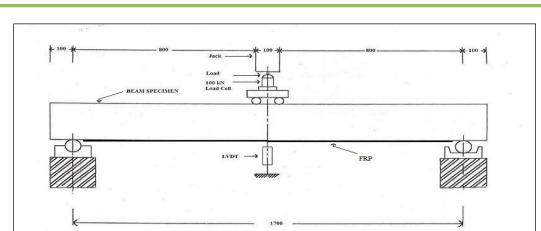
LOADING ARRANGEMENT FOR BEAM SPECIMENS
